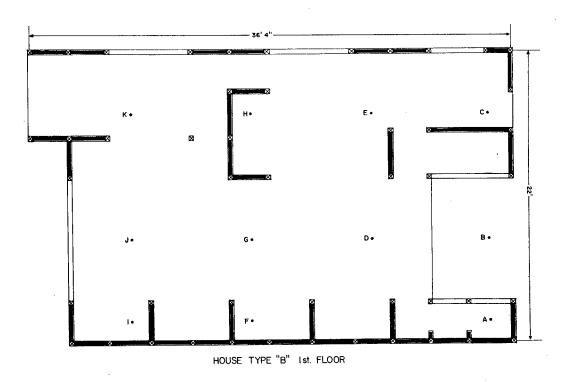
Floor plan of lower floor of house type B showing station locations.
